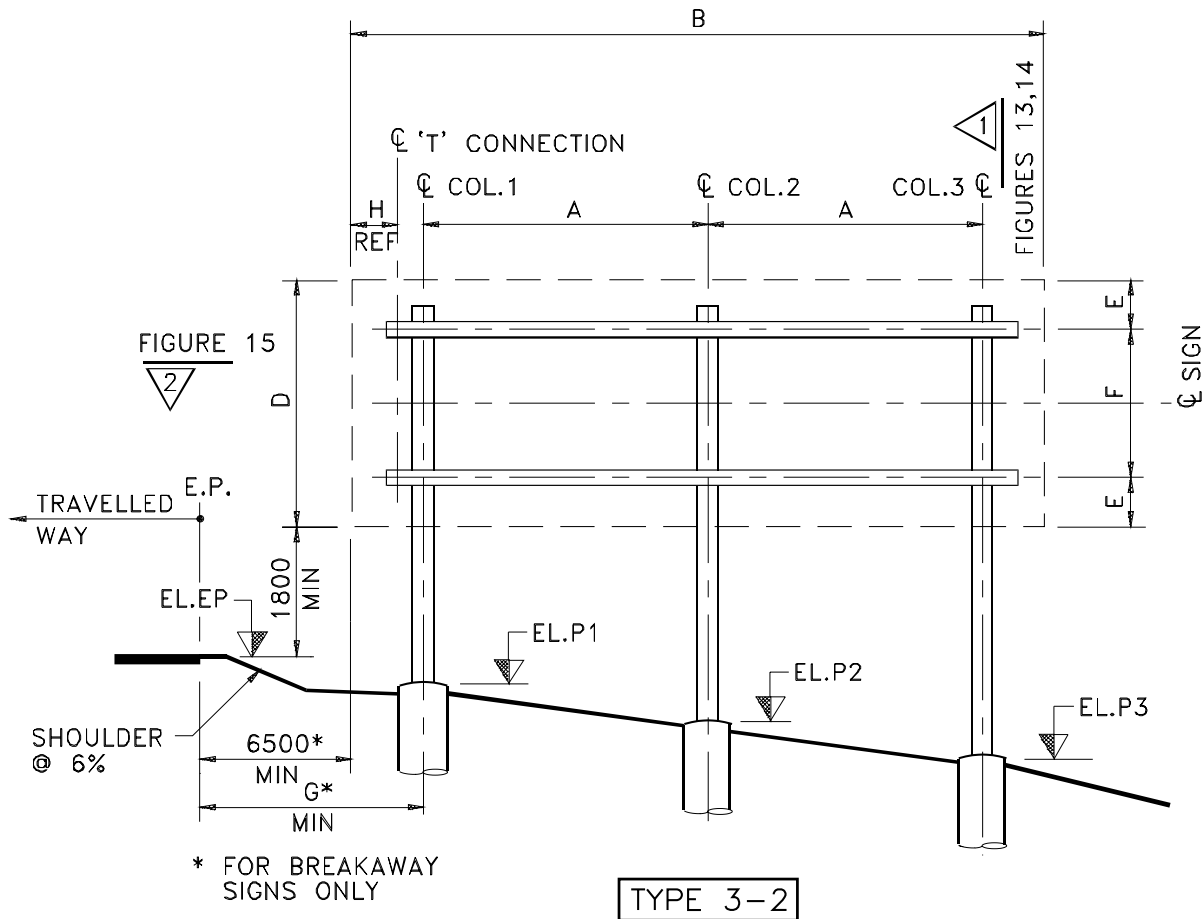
Continued – Assembly and Installation Dimensions (Steel, Type 2-3)
